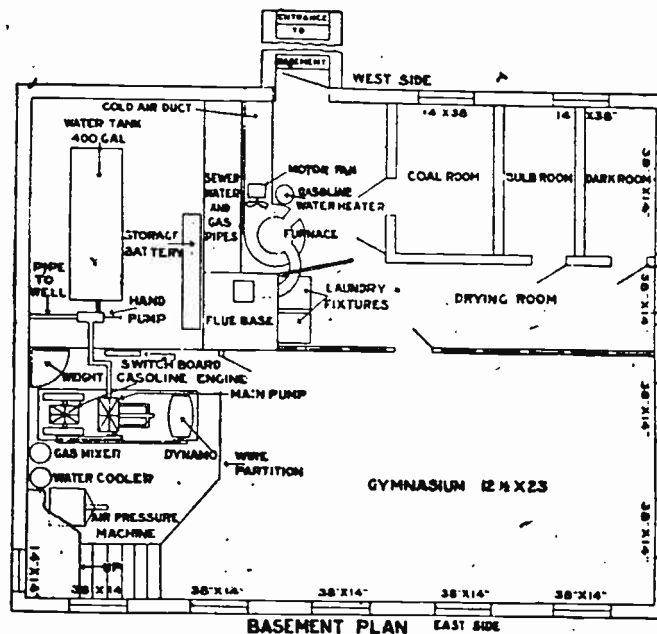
Basement plan, model rural school, Kirksville, Mo.
